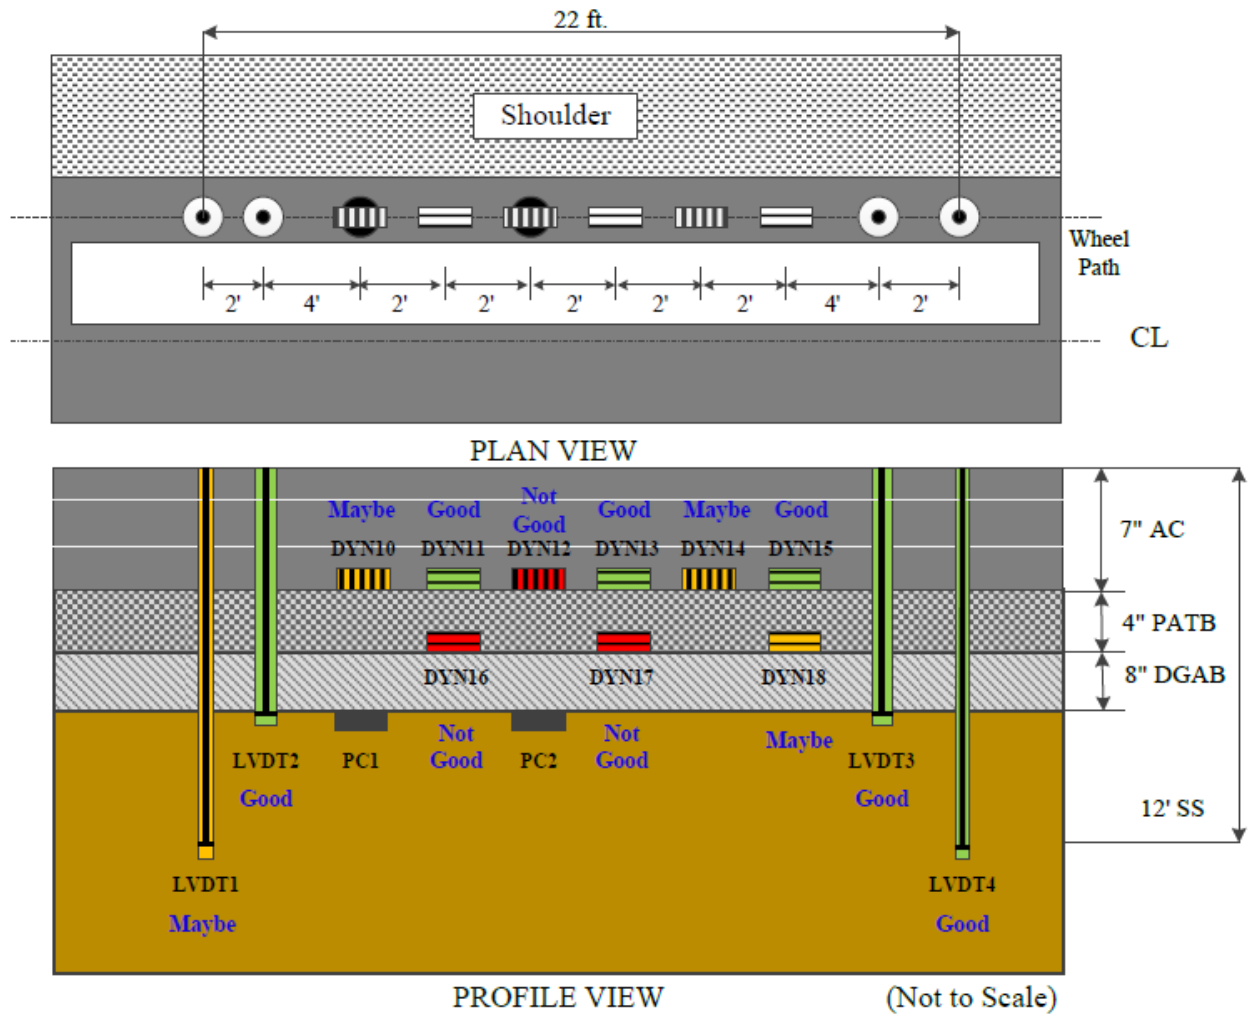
Illustration. QC results by sensor type for test section 390108 test J8G.
